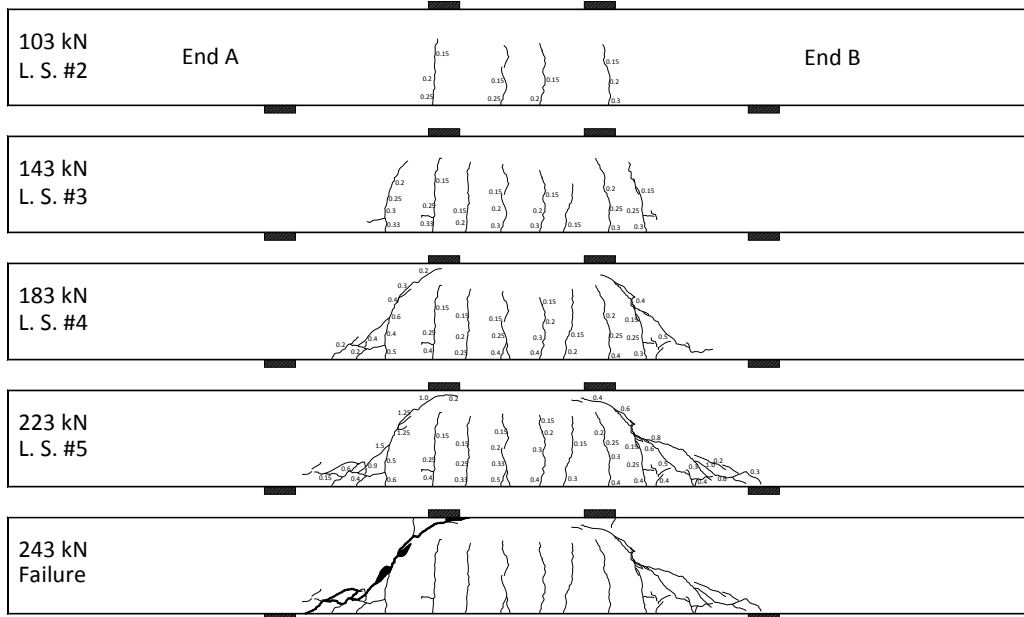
Crack diagrams of specimen A3N showing the development of the cracks and the widths as loading progressed.
